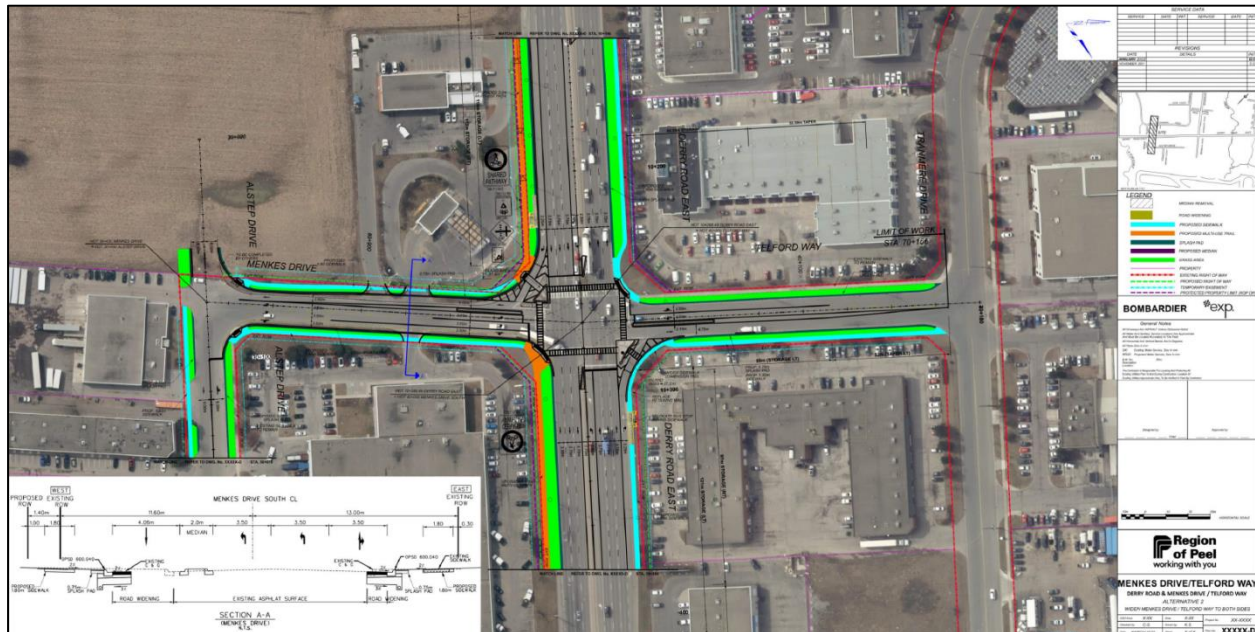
Preferred Alternative Design Concept – Derry Road East and Menkes Drive / Telford Way (Alternative 2)
